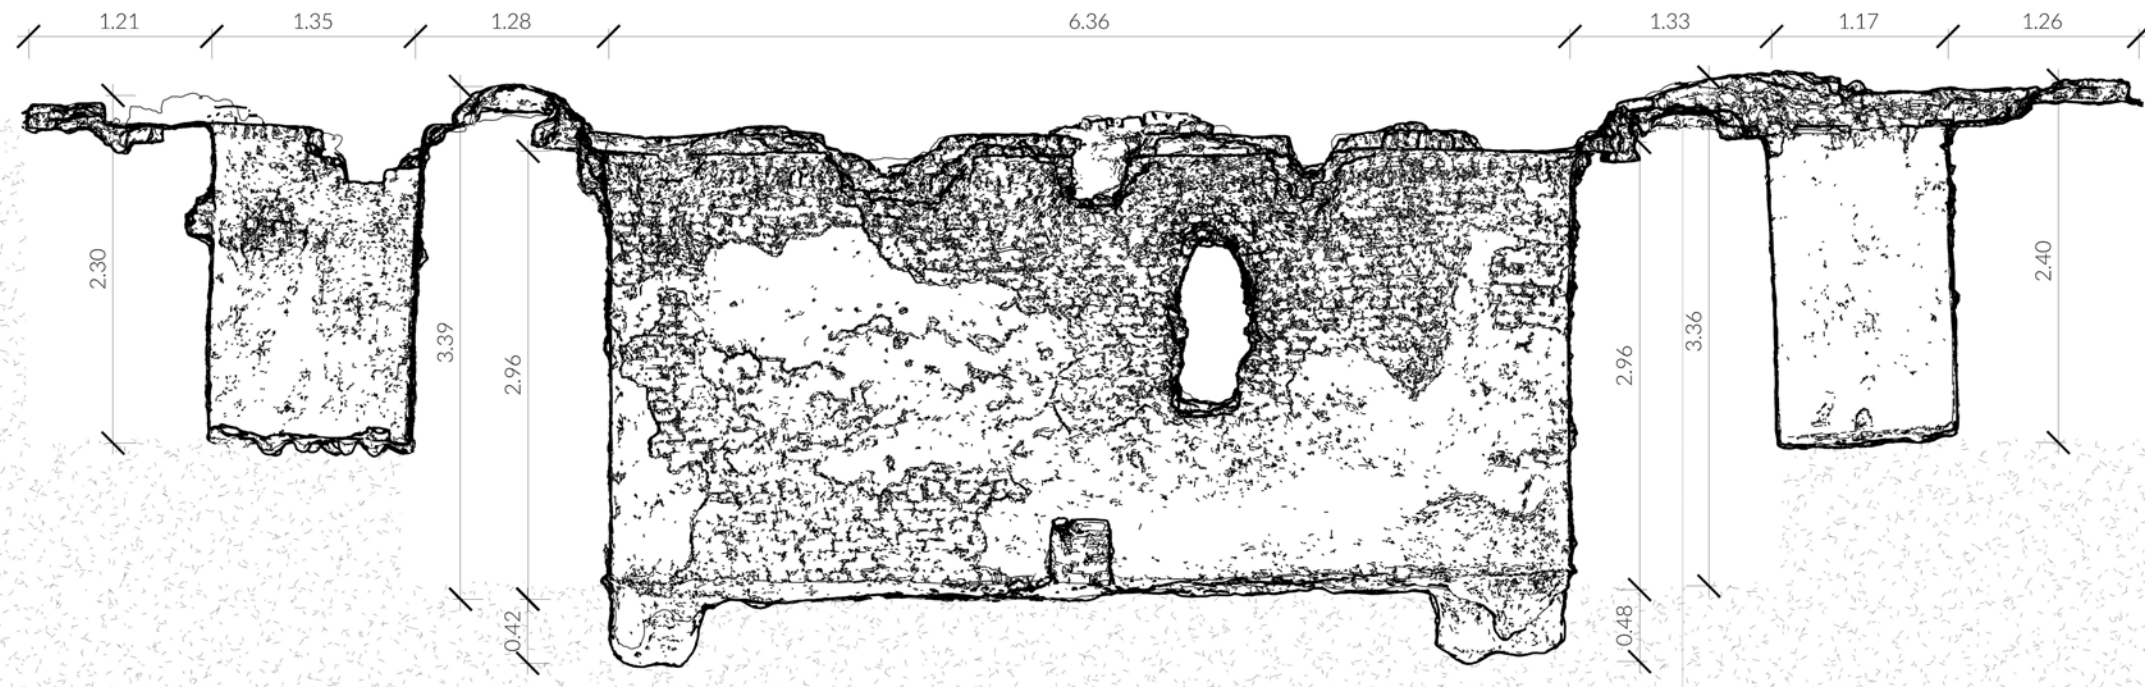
Section through YKK8 - YKK - YKK3, east walls, 1:50
